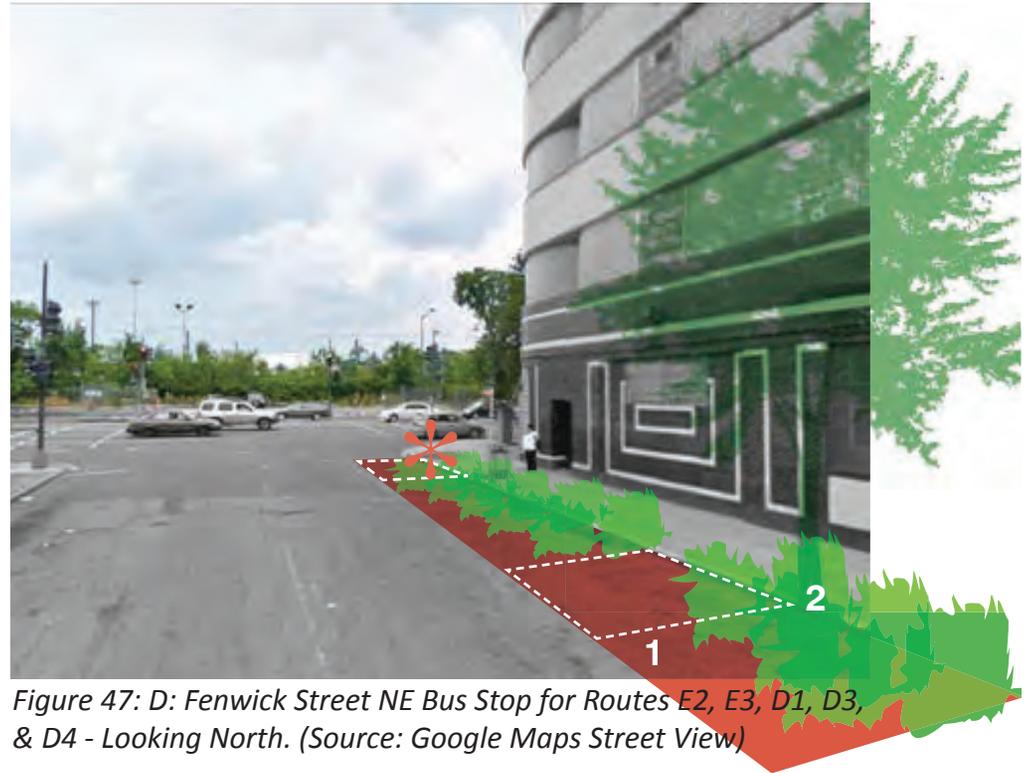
D: Fenwick Street NE Bus Stop for Routes E2, E3, D1, D3, & D4 - Looking North. (Source: Google Maps Street View)
